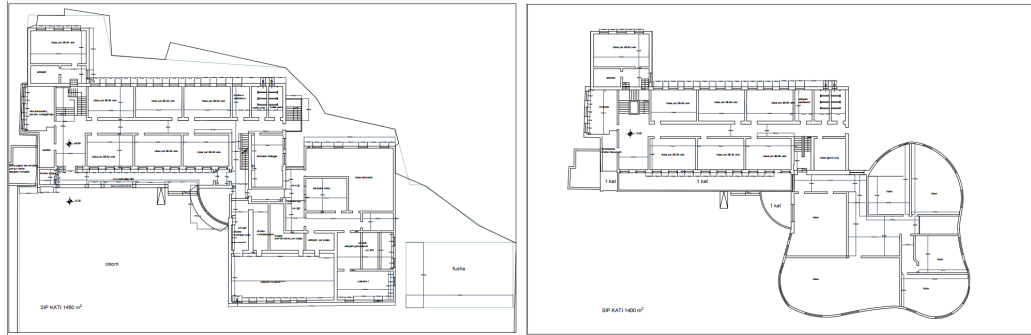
Sami Frasheri school (1963) plans- ground floor (left) and first floor (right)
